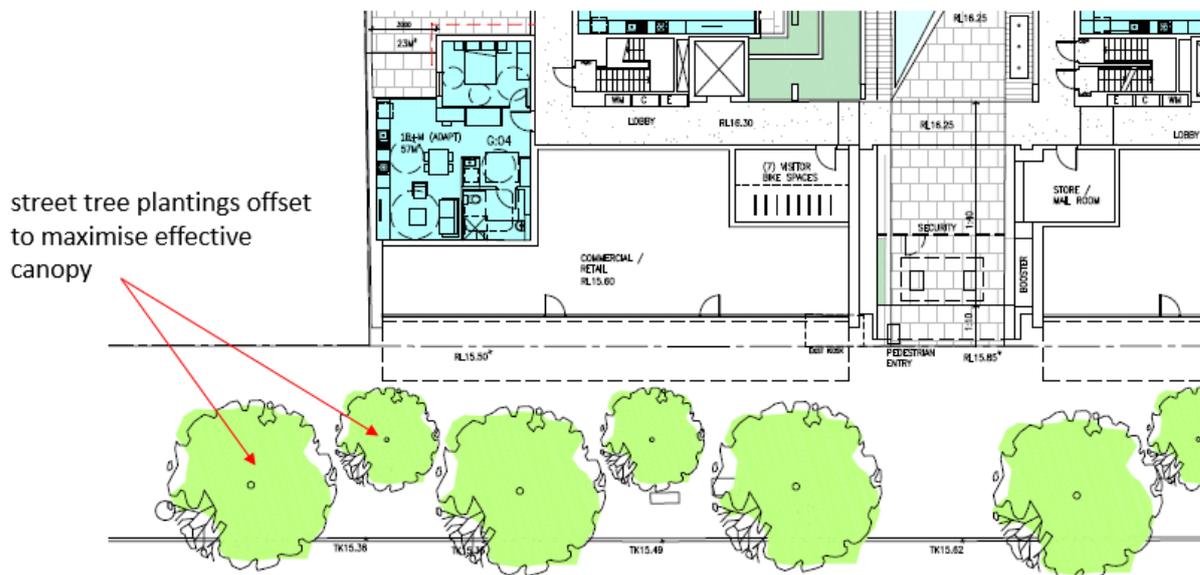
extract from submitted plan DA04 showing 'offset' planting to maximise canopy spread
